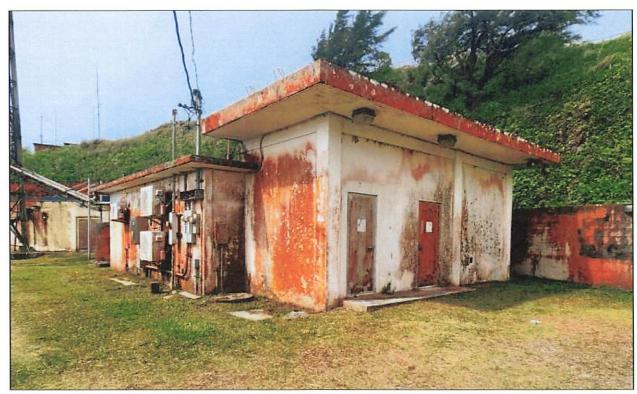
View south of north corner of Building 1 (photo: D. Perzinski, 6/15/23).
